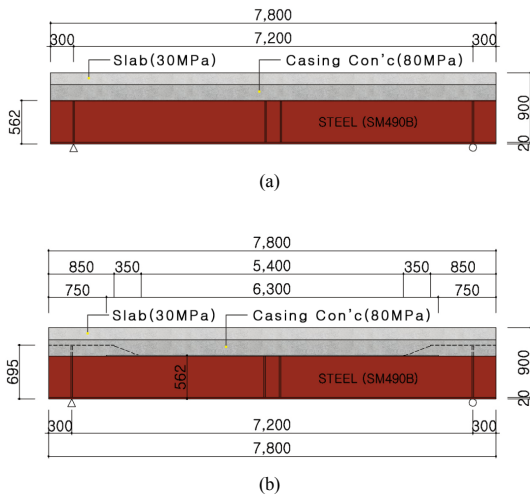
Longitudinal Section of Specimens (Unit:mm)
